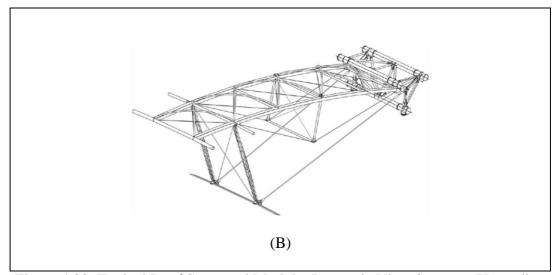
Typical Roof Structural Module: Isometric View Source : (Upgrading the Spoke Wheel Stadium Roof Concept: Ingenta Connect, 2020).
